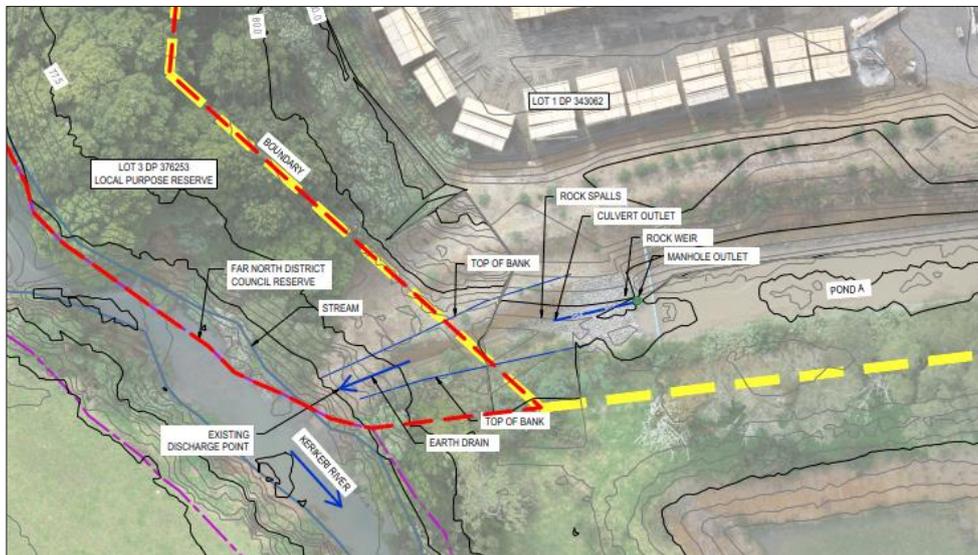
Plan showing the stormwater discharge (Source: Haigh Workman)
